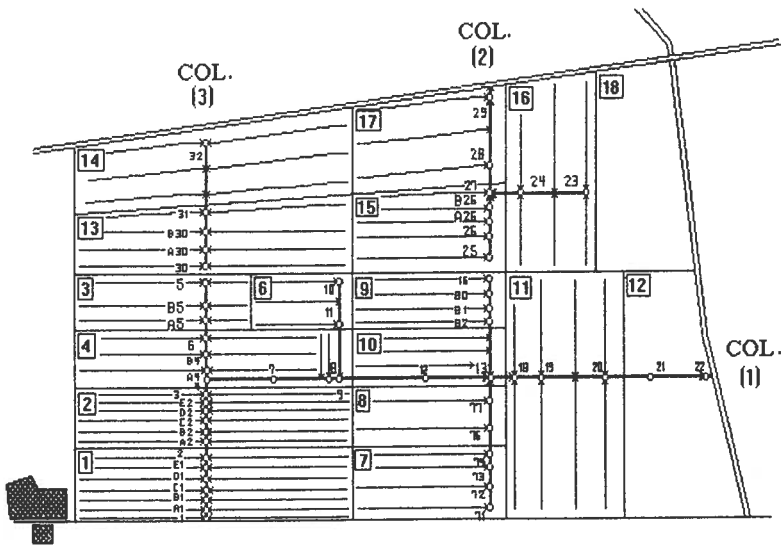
Layout of Subsurface Drainage System at MPA and Drainage Units
